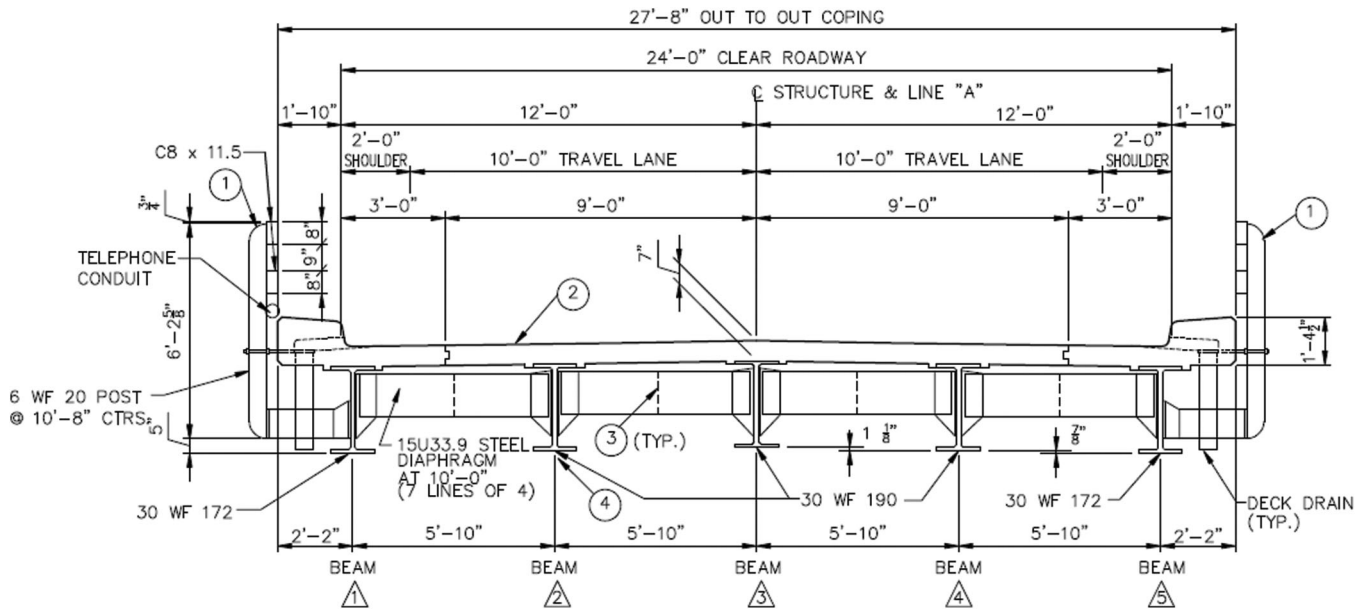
Existing Sugar Creek Bridge Cross Section
